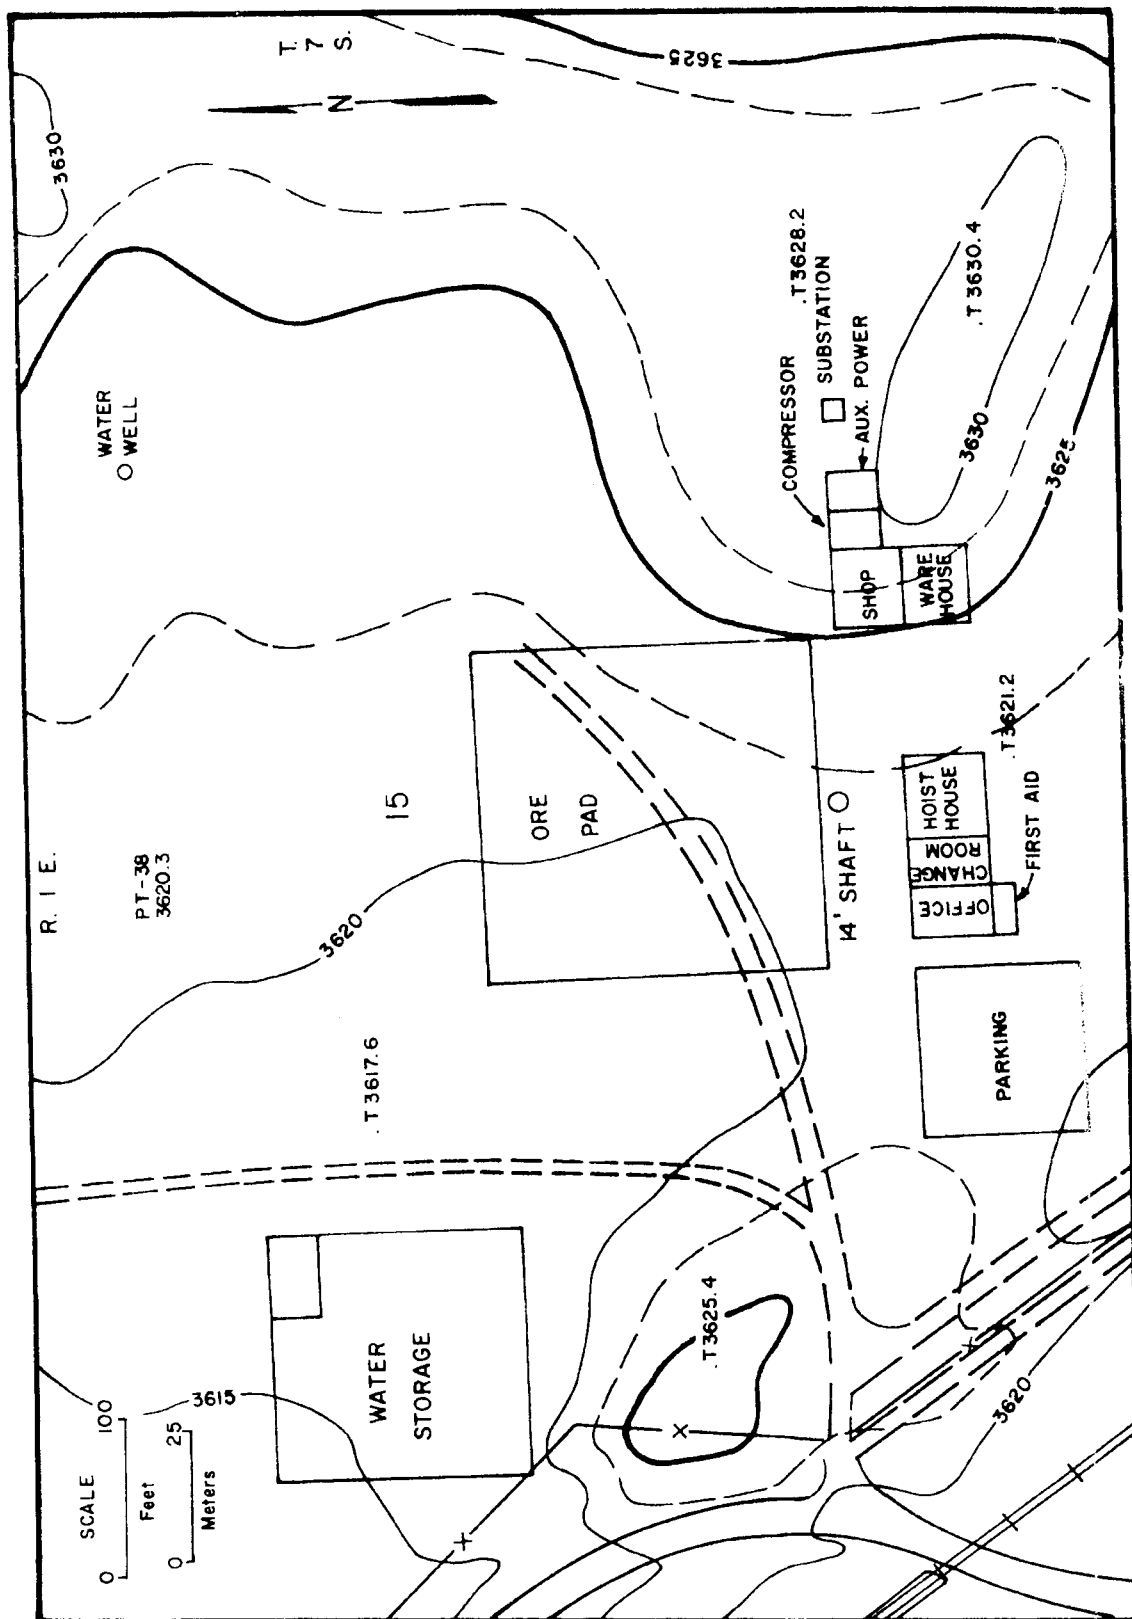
Proposed Initial Shaft Site Layout
